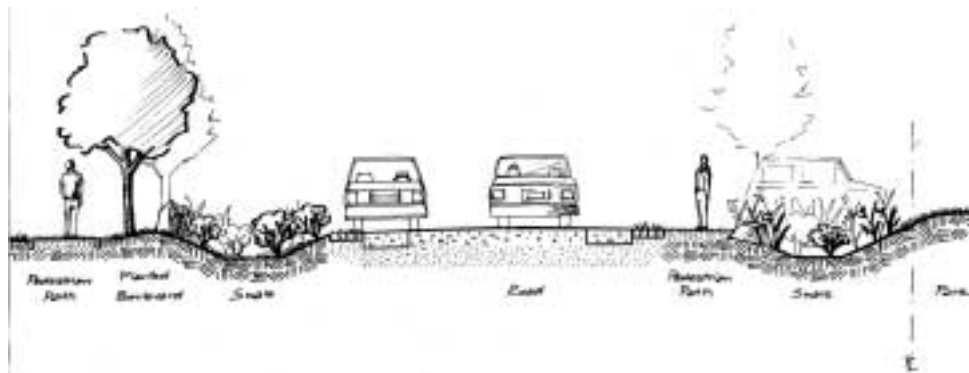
Typical section of two-way street with revision. Road is 5.6 metres wide.
